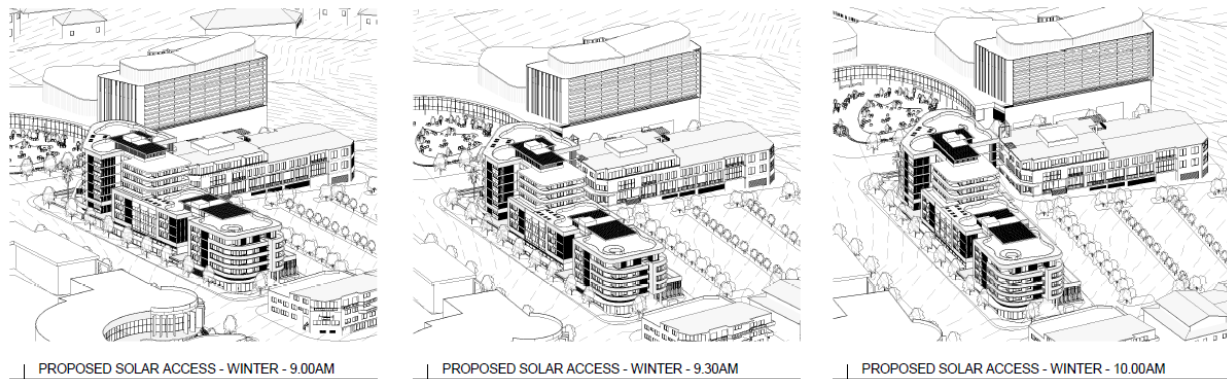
Extract from Sun Views Plans mid-winter 9am to 10am (Source: DWA Architects)
